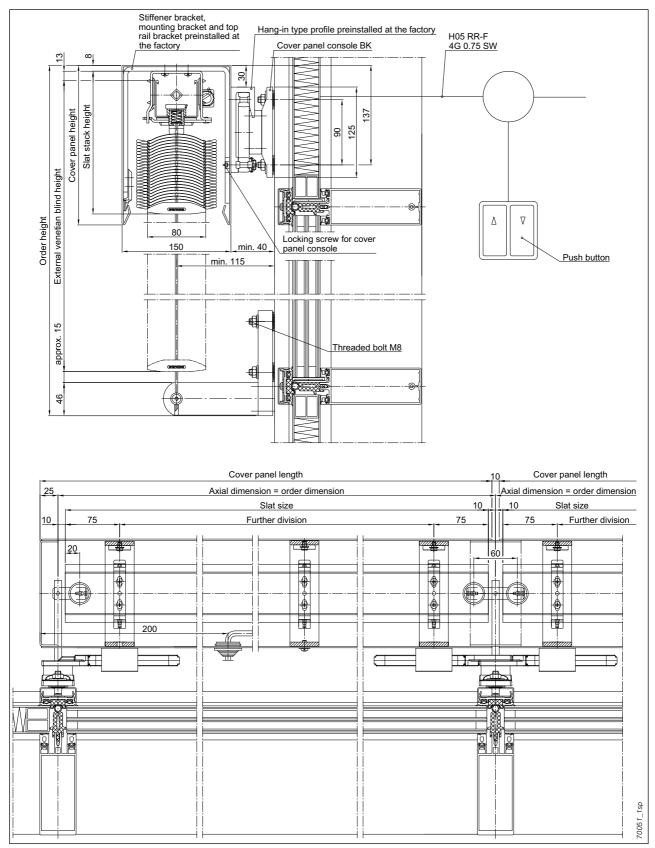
Mounting example for T/M system cover panel E 80 A2 S
